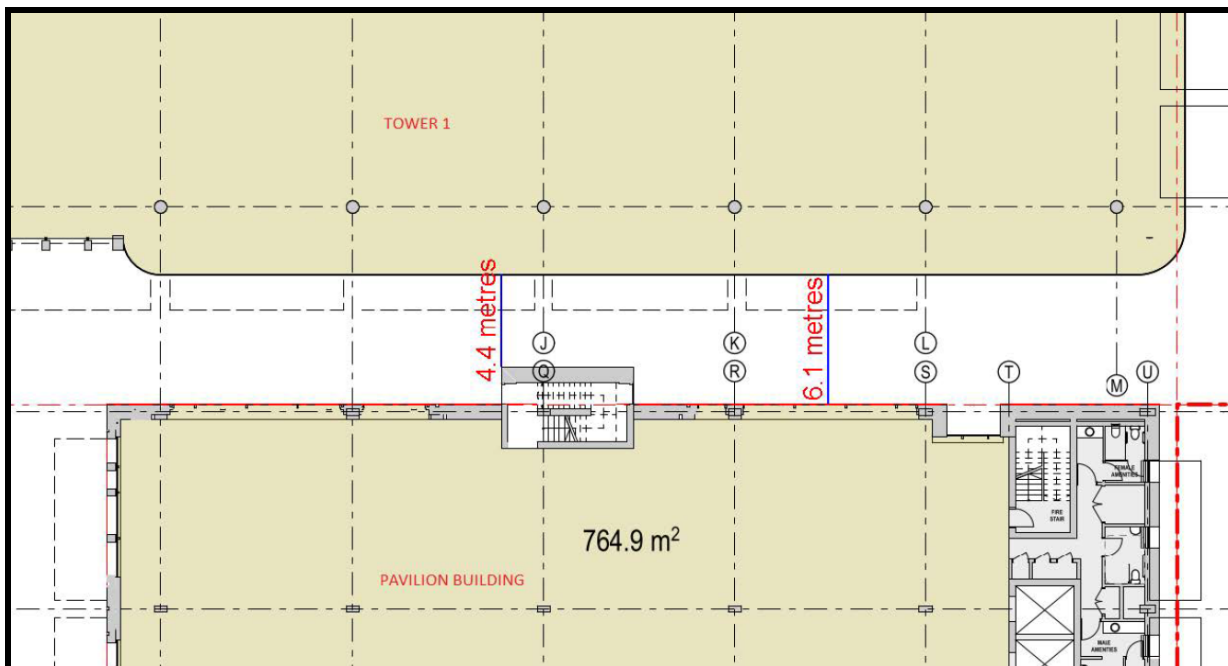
Upper Floors – showing 6.1m separation, with 4.4m pinch point at fire stair location
